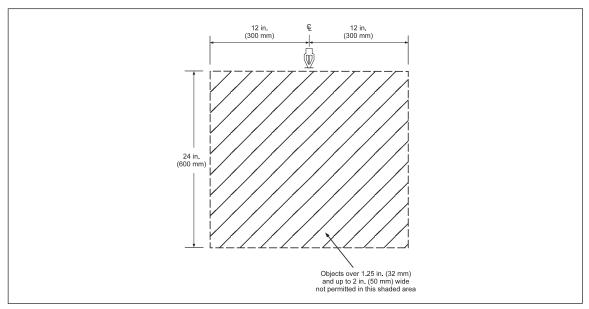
Obstruction area to inner core discharge pattern of pendent Storage sprinklers for objects over 1.25 in. (32 mm) and up to 2 in. (50 mm) wide
